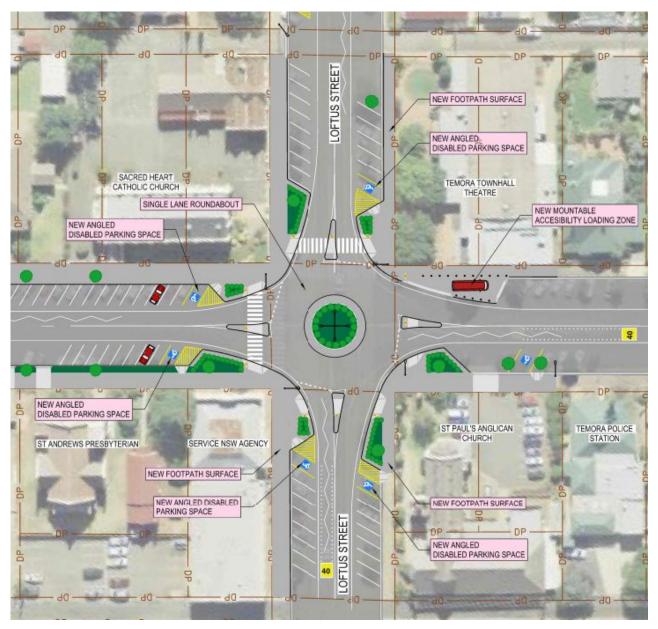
Updated version of plan, showing retained angle parking, with blister to support new proposed roundabout, and hearse loading bay deleted
